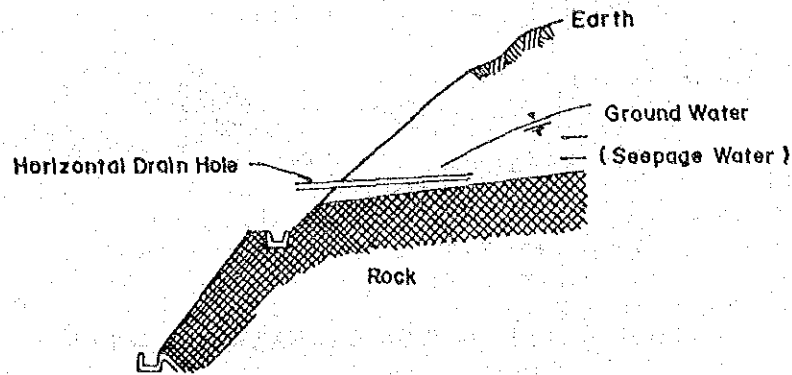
HORIZONTAL DRAIN HOLE
